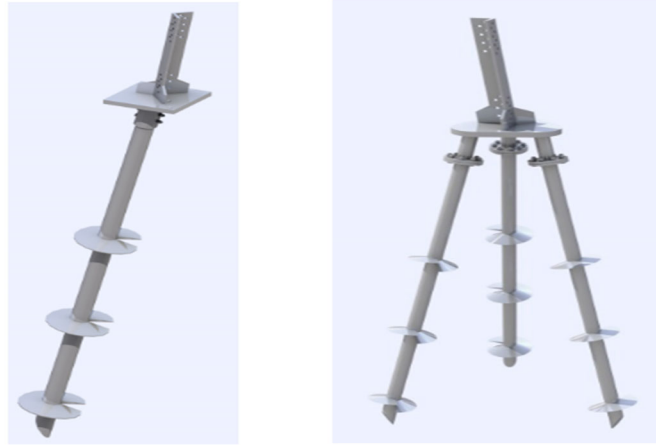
Inclined single screw anchor foundation and All-steel group screw anchor foundation with different inclined angles
